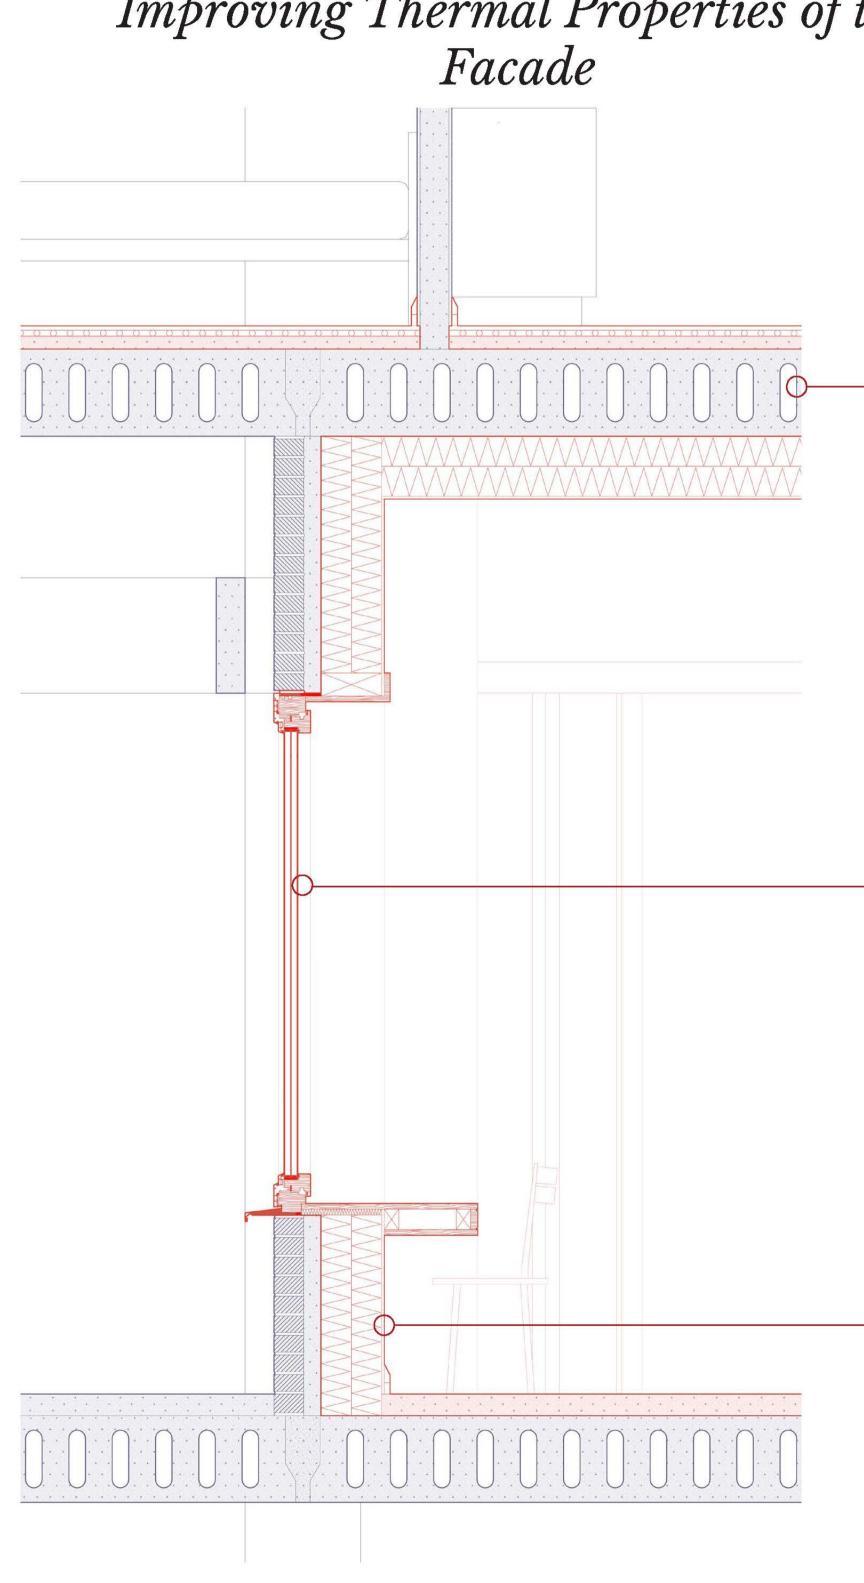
(Up) Insulating Existing Ground Floor Spaces. Fig. 12. (Left) Proposed Modifications to Existing Facade.
